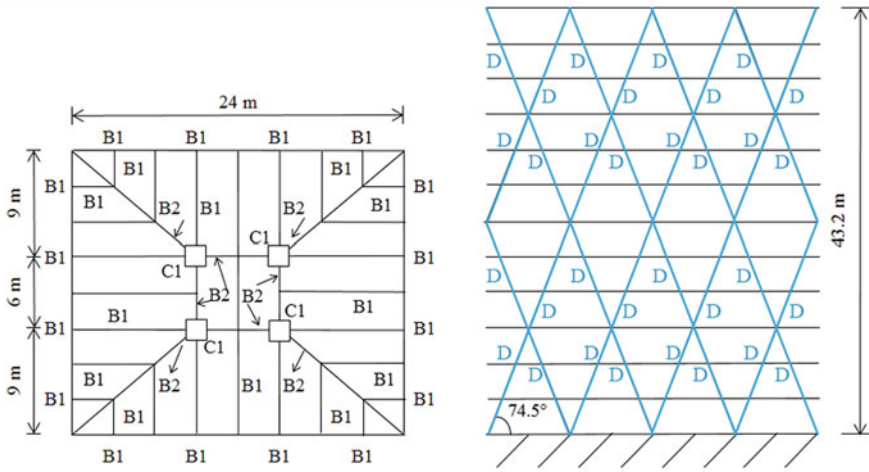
Plan and elevation of 12-storey diagrid building [3]
